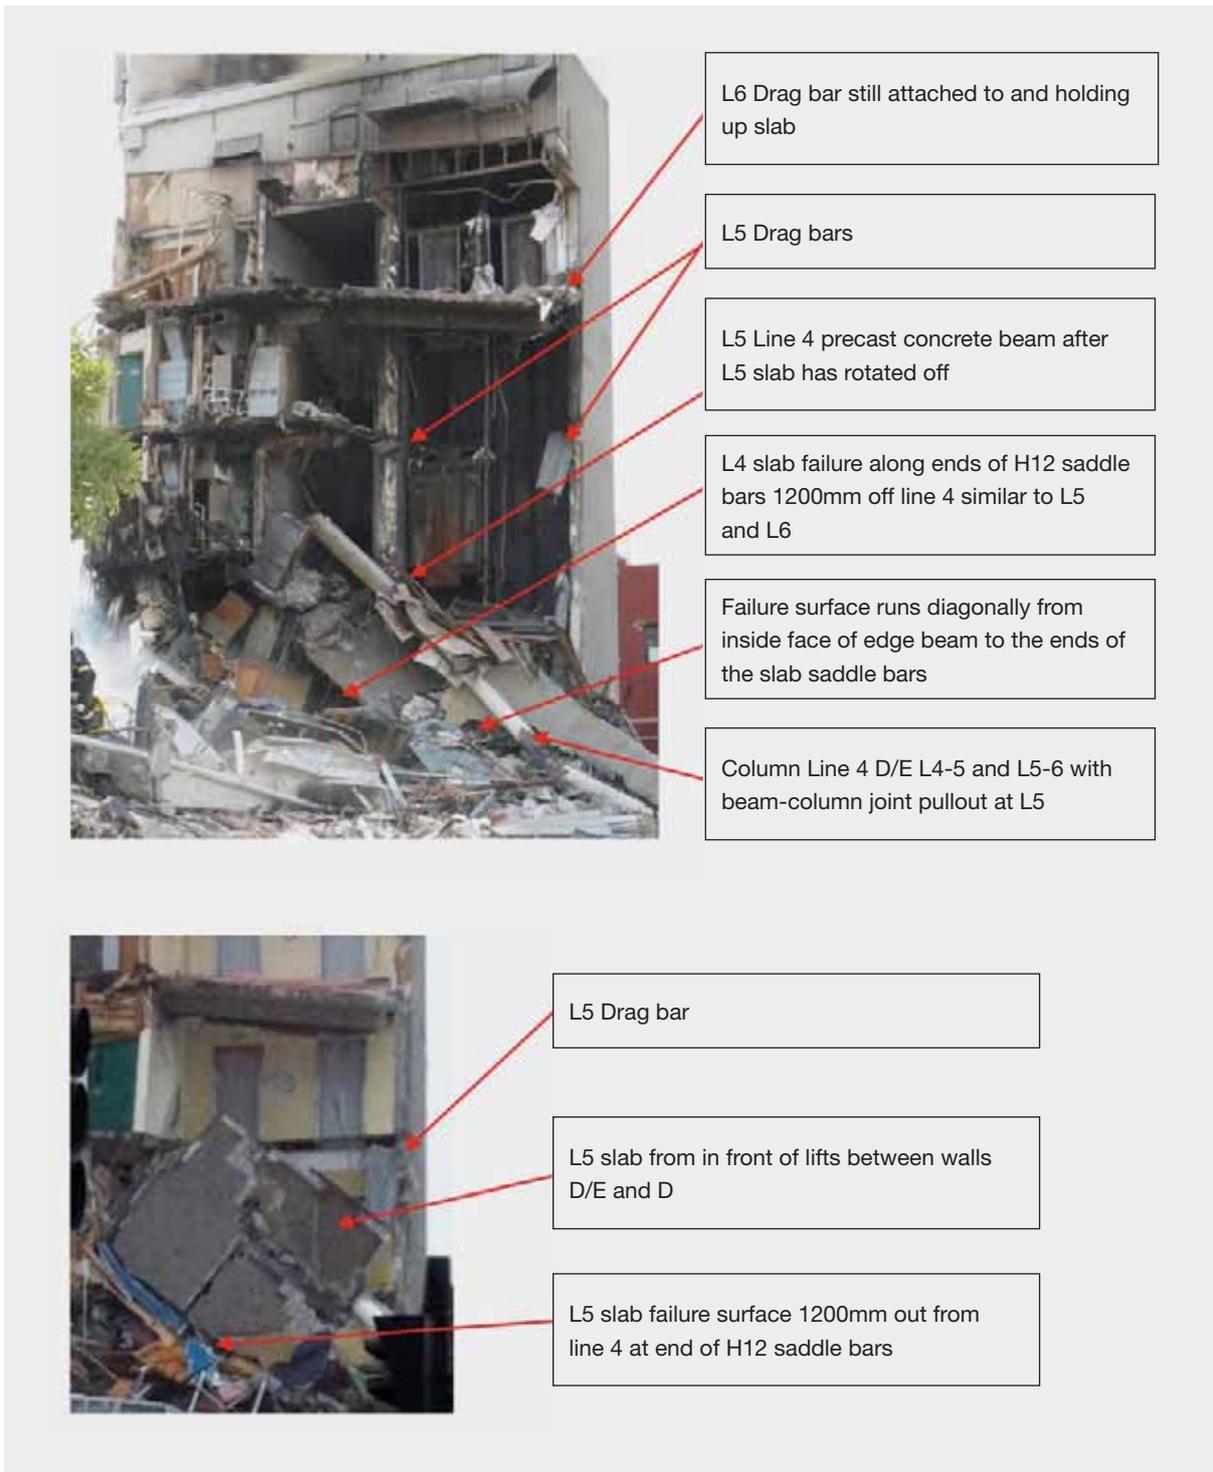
Figures 163 and 164 from the Hyland/Smith report showing diaphragm failure at the north wall complex
